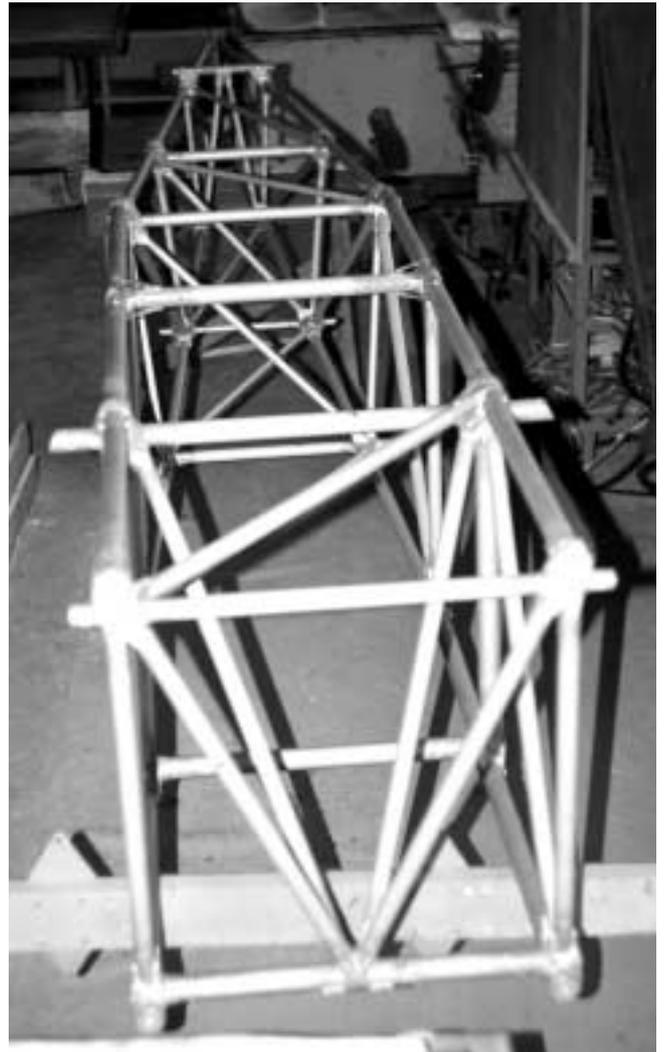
Truss structure realized according to proposed conception of composite joints of load-bearing structures.
